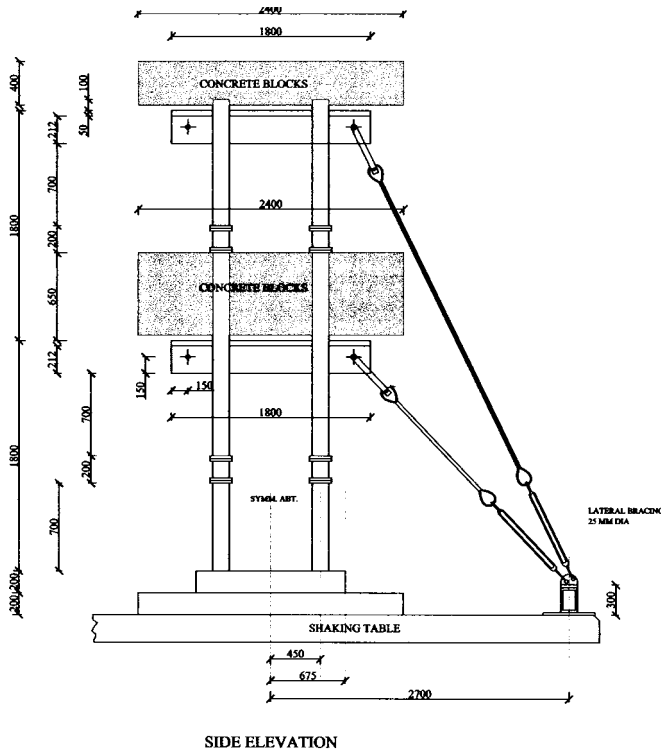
Test Structure and Test Arrangement (All dimensions are in mm)
